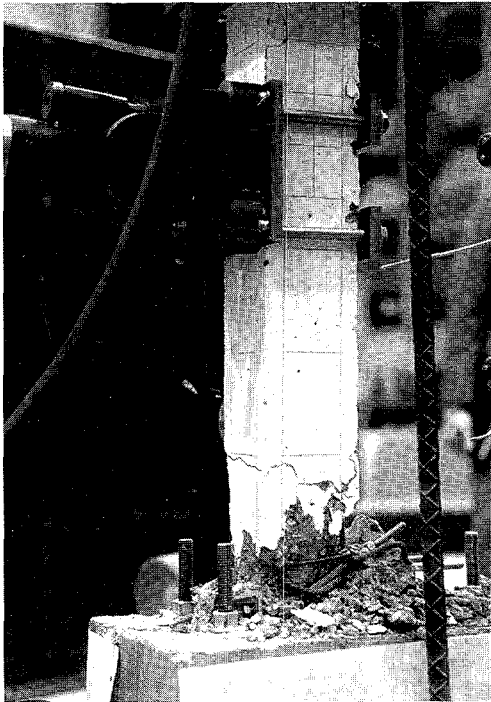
Progressive Damage Lower Interior Column with lap splice
